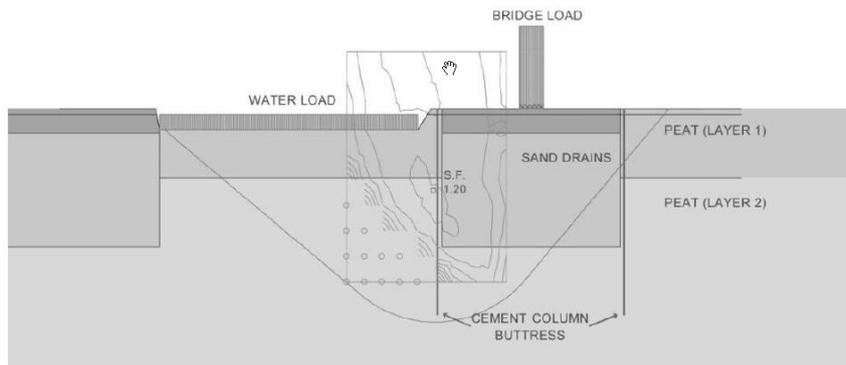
The critical sliding surface for slope stability during working life of the bridge
